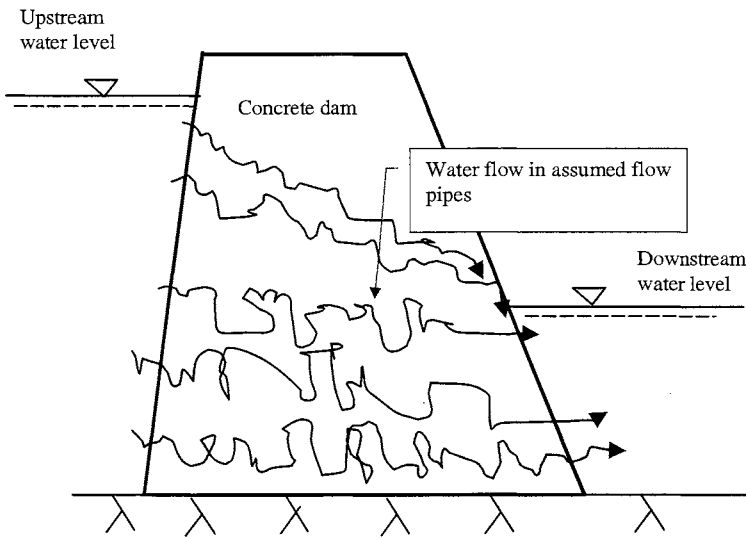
Water flow in assumed flow pipes in a concrete dam.
